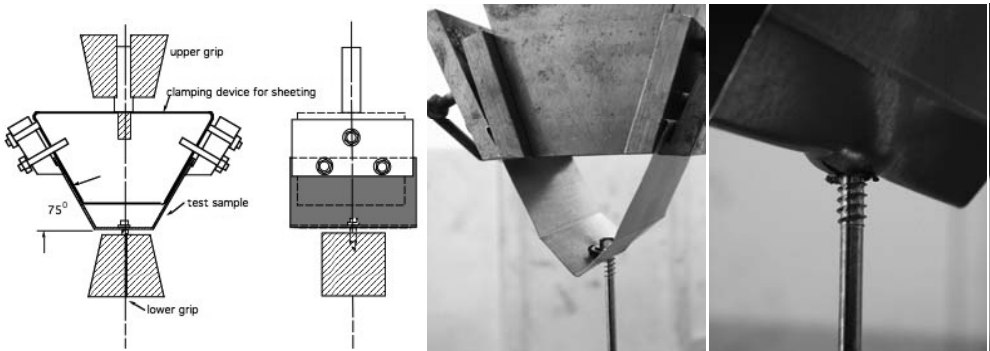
Test set-up according to [5] and failure mode for fixings of steel sheeting.
